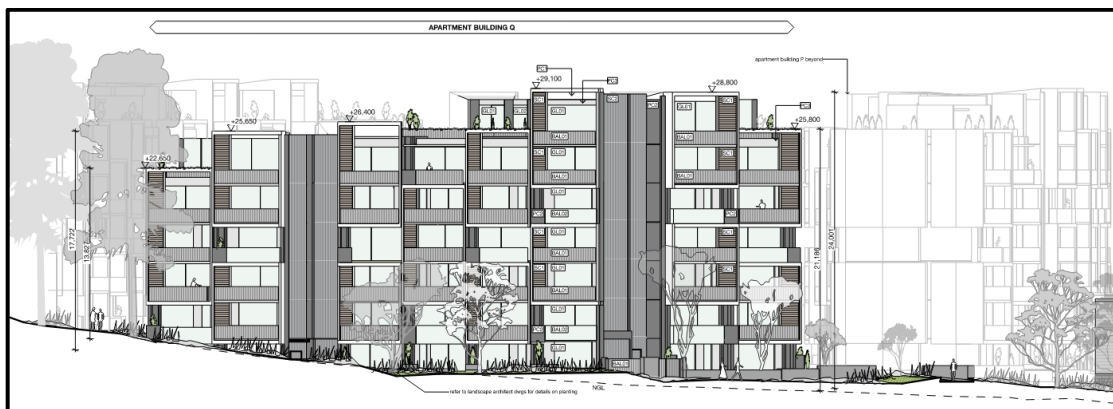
The north-eastern elevation view of Building Q showing the reduction in scale of the building toward the interface with Cadbury Road frontage.
